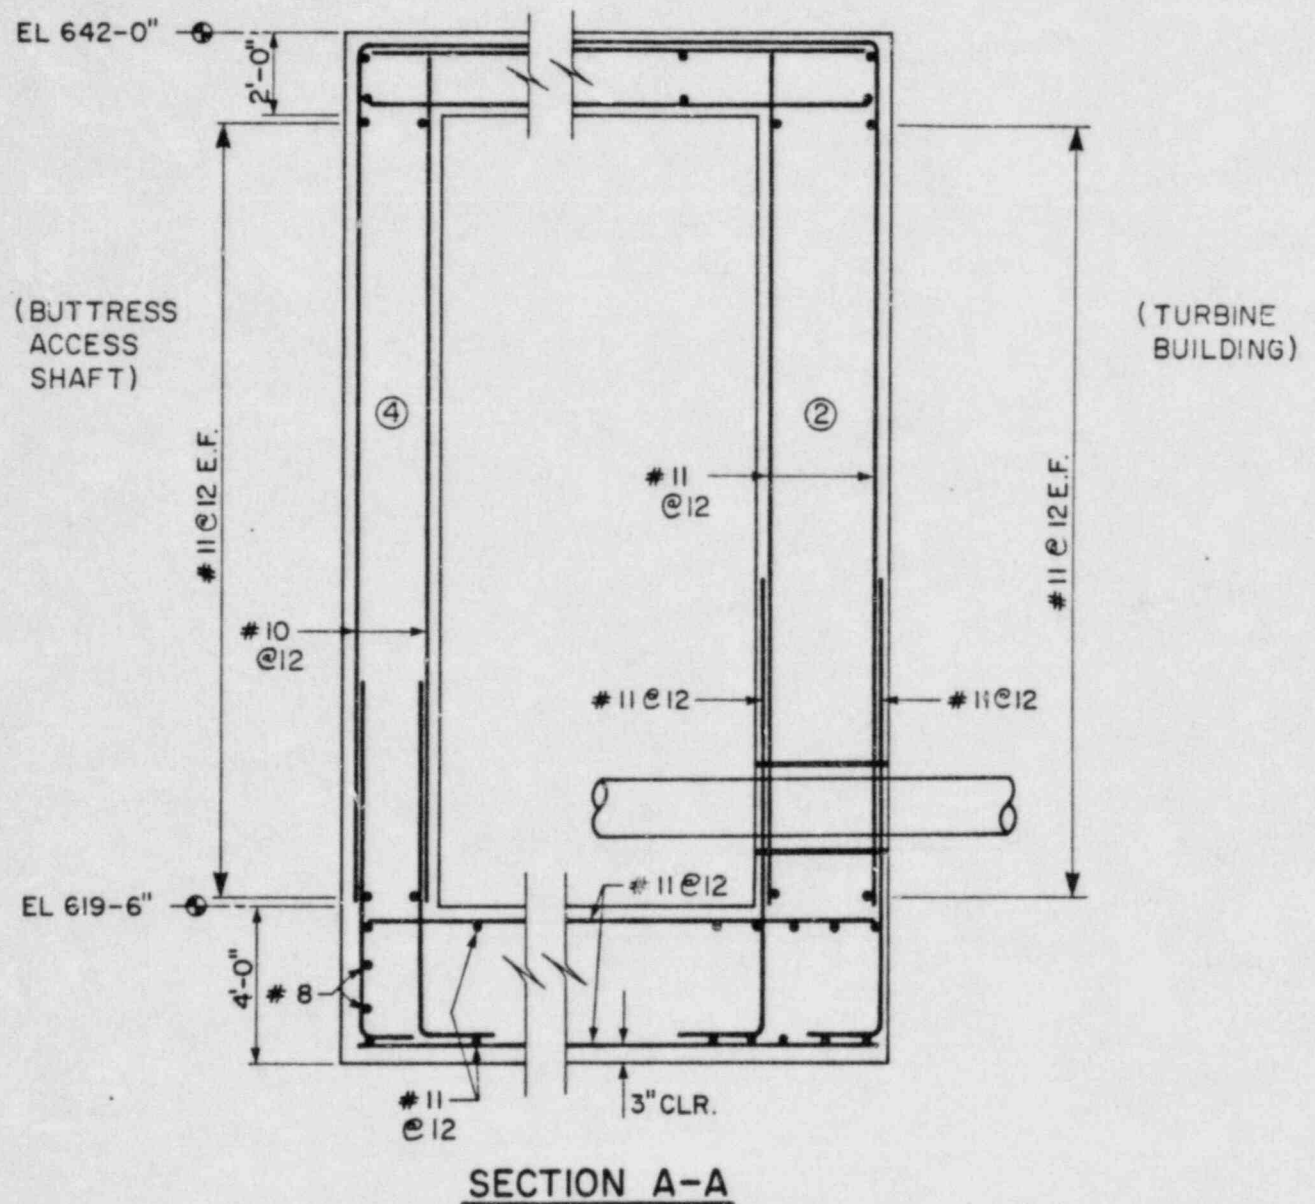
Reinforcement in Feedwater Isolation Valve Pit Walls 2 and 4 - Vertical Section
